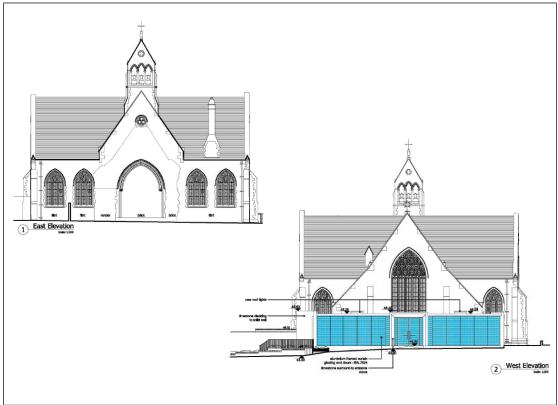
Proposed elevations (Greyfriars Church, East & West)
